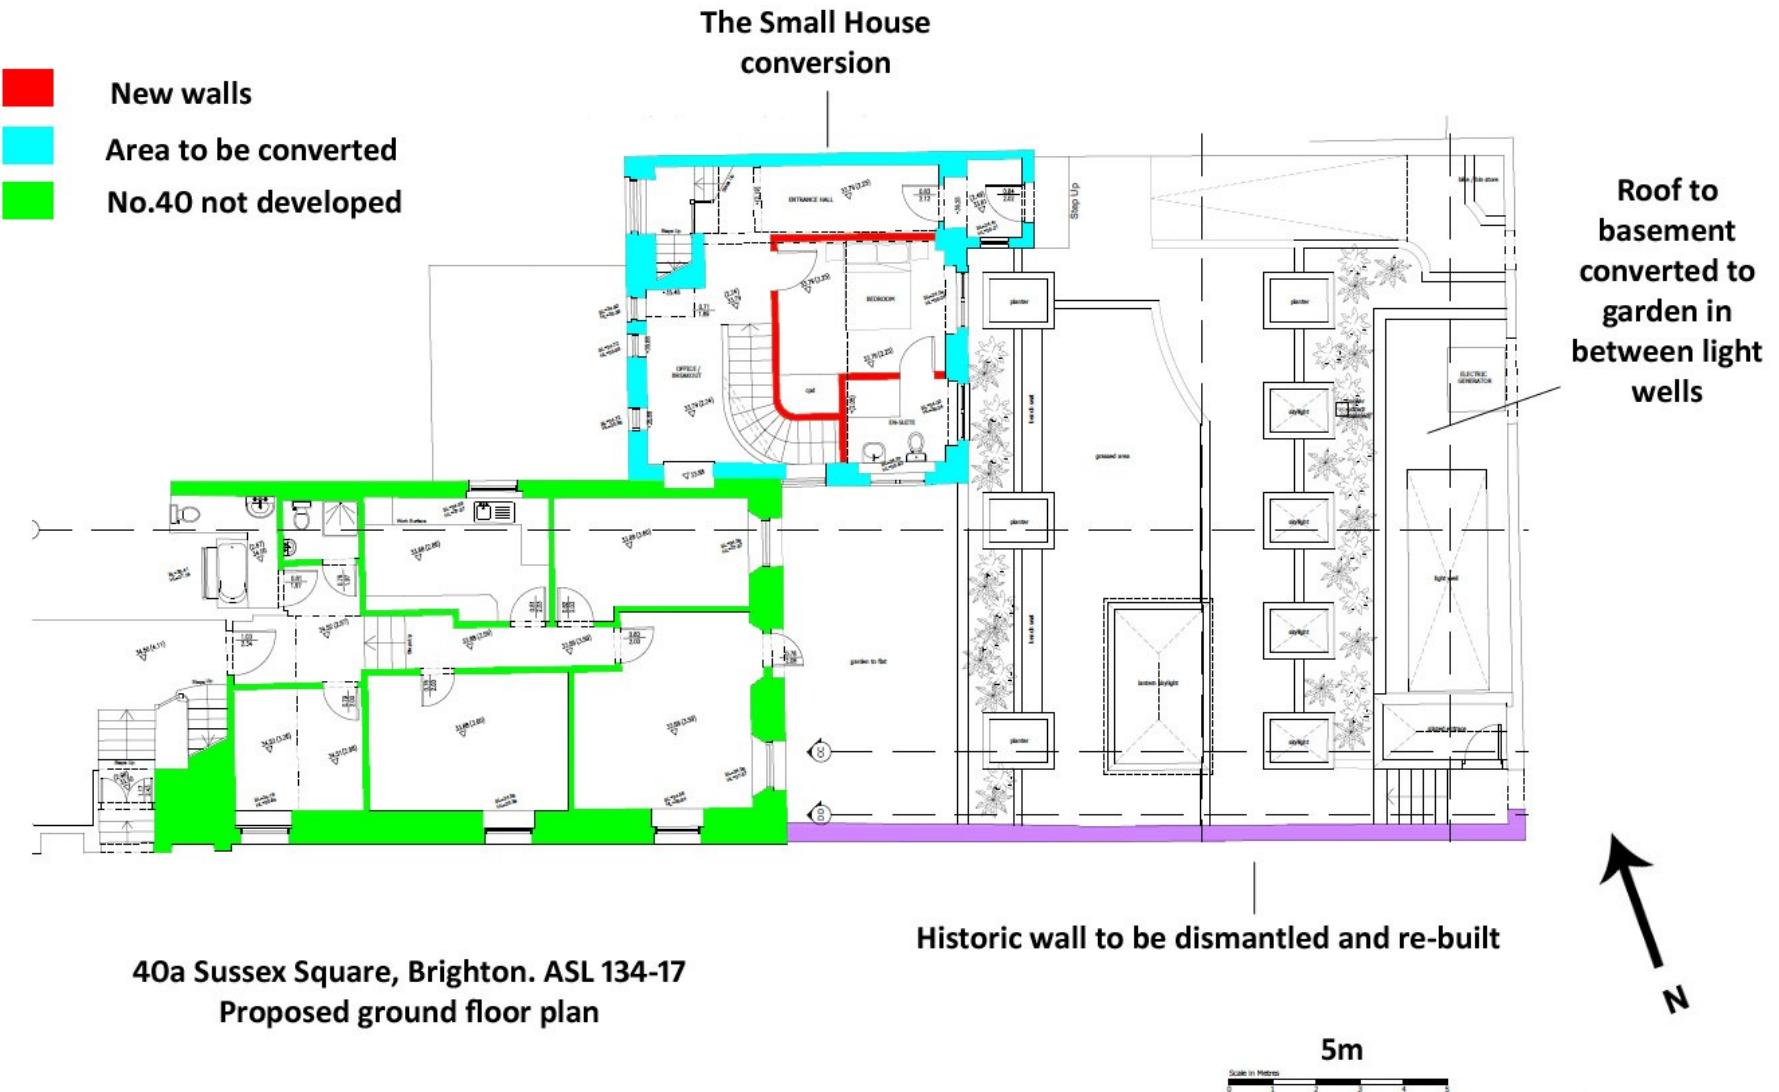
Proposed ground-floor plan (adapted from Savills' drawing number: 1054512/121, revision D ©2015).
